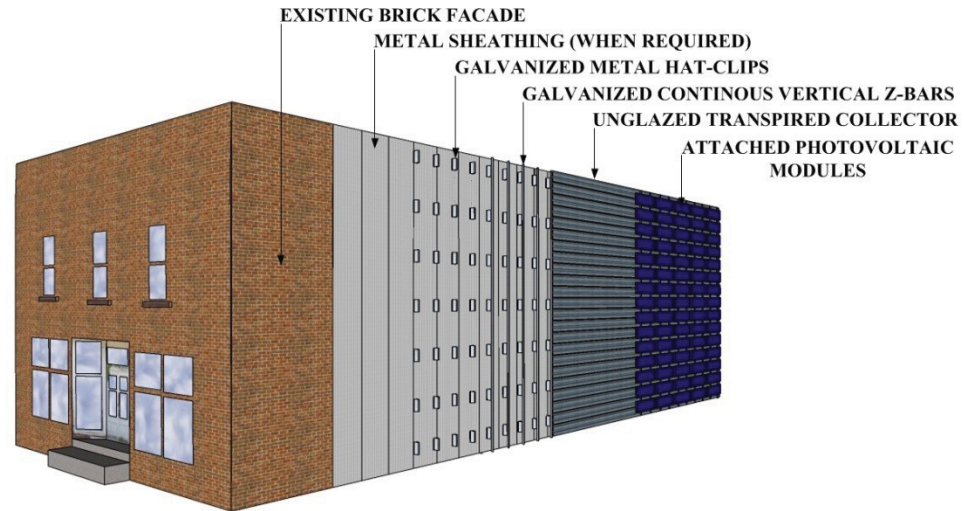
Retrofit installation of a PV/T system over an existing façade.
